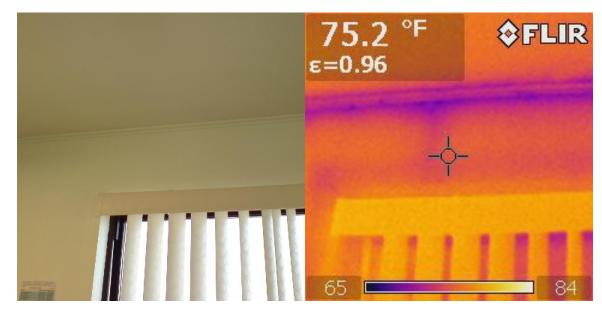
Infiltration Detection—Wall and Ceiling Seam
